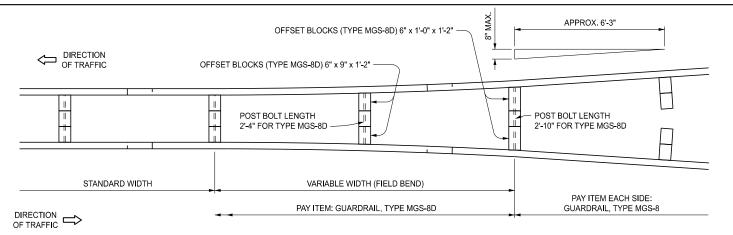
## DETAIL SHOWING TRANSITION FROM GUARDRAIL, TYPE MGS-8 TO GUARDRAIL, TYPE MGS-8D
